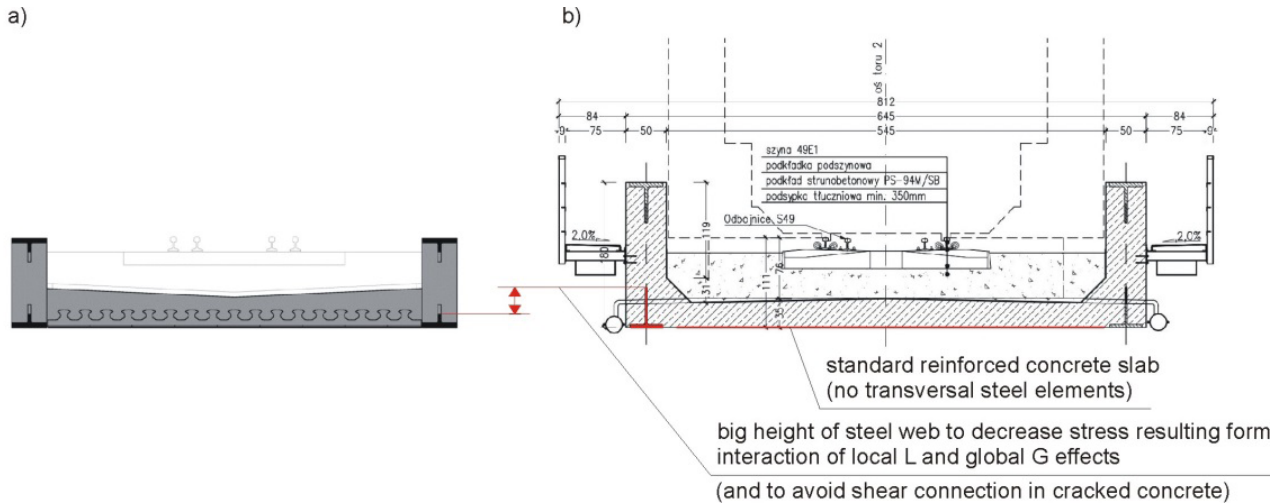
The main differences between 13 m span bridge next to Spergau by “SSF Ingenieure” design office and 23 m bridge in Dąbrowa Górnicza by “FASYS Mosty” design office (reinforced concrete slab and enlarged height of webs of T-sections): a) bridge by SSF using external reinforcement, b) bridge in Dąbrowa Górnicza using general composite section.
